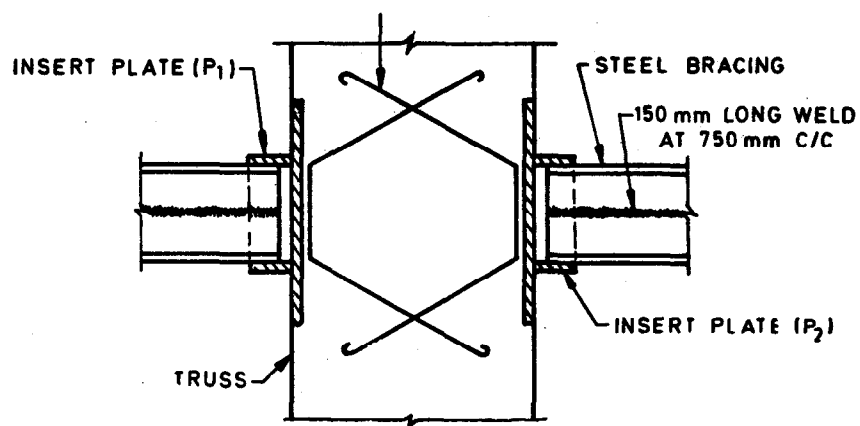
TYPICAL DETAILS OF TRUSS JOINTS
